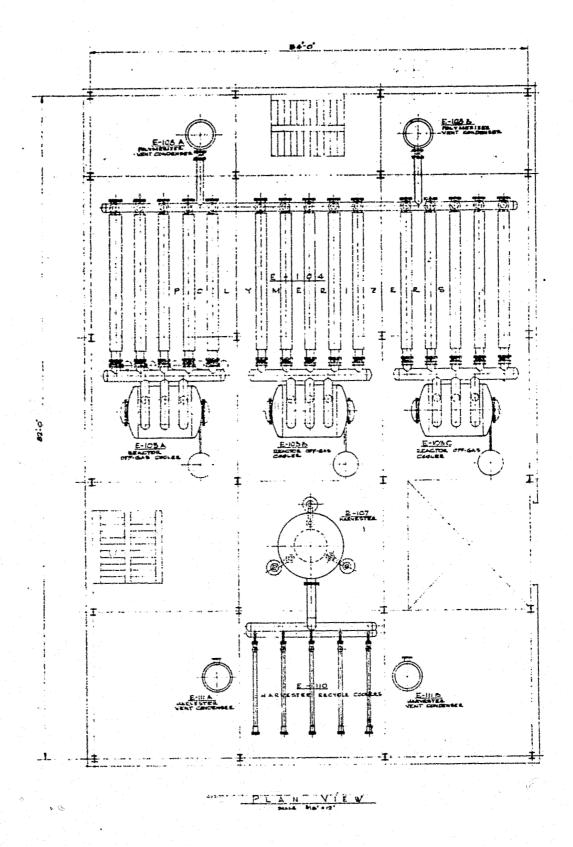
Conceptual layout of 100 MT/yr plant.
